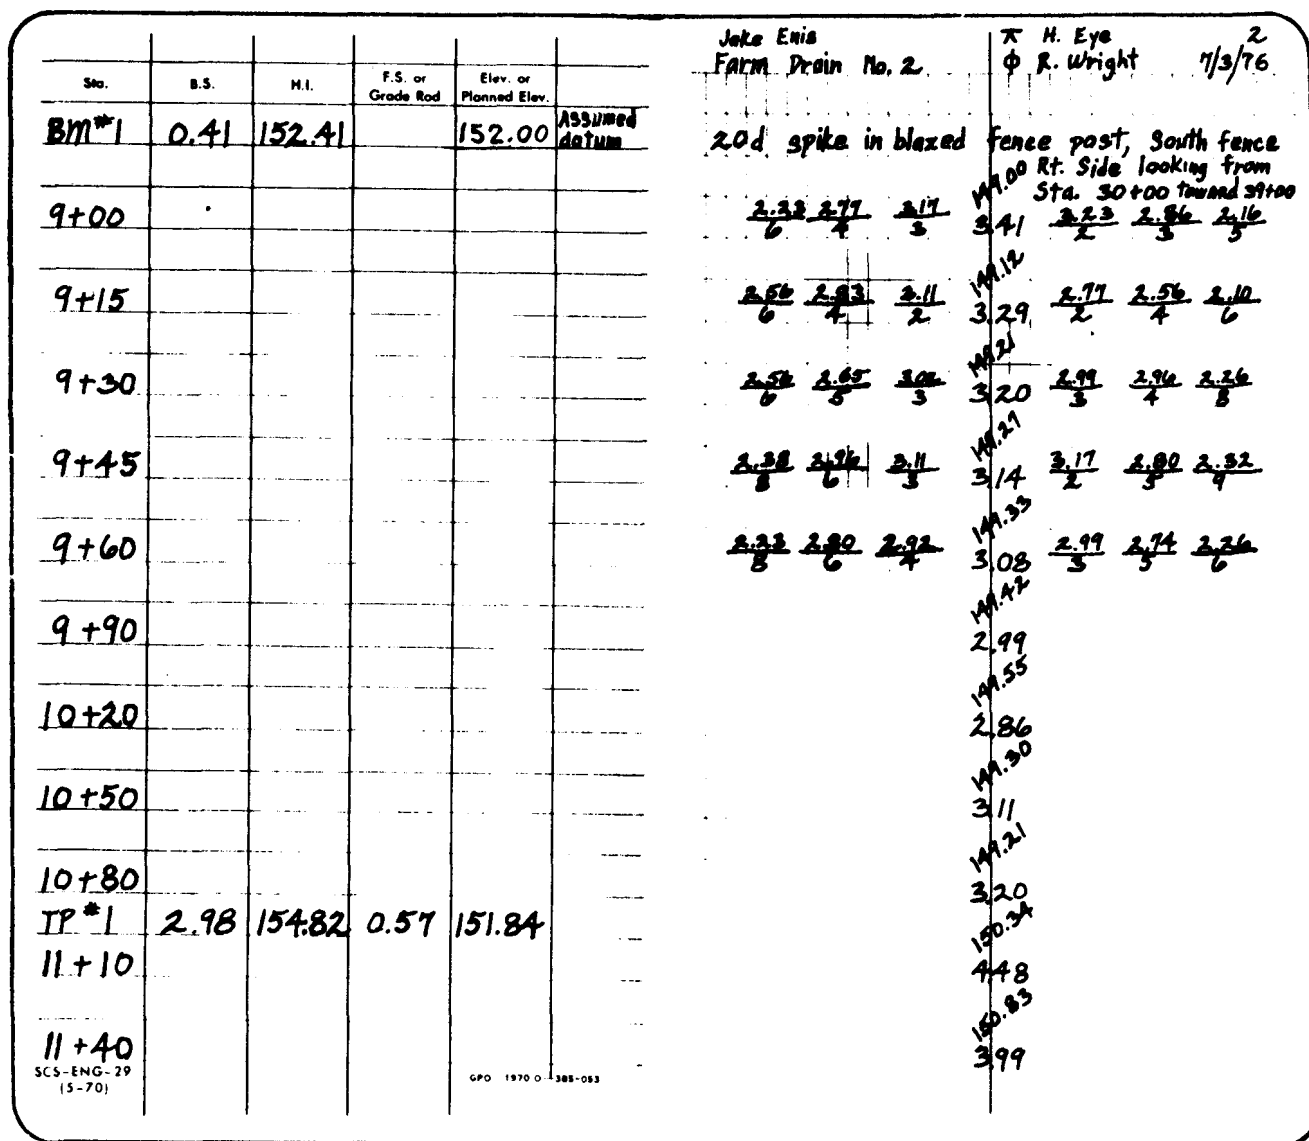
Survey notes—profile and cross section (metric)—continued.
